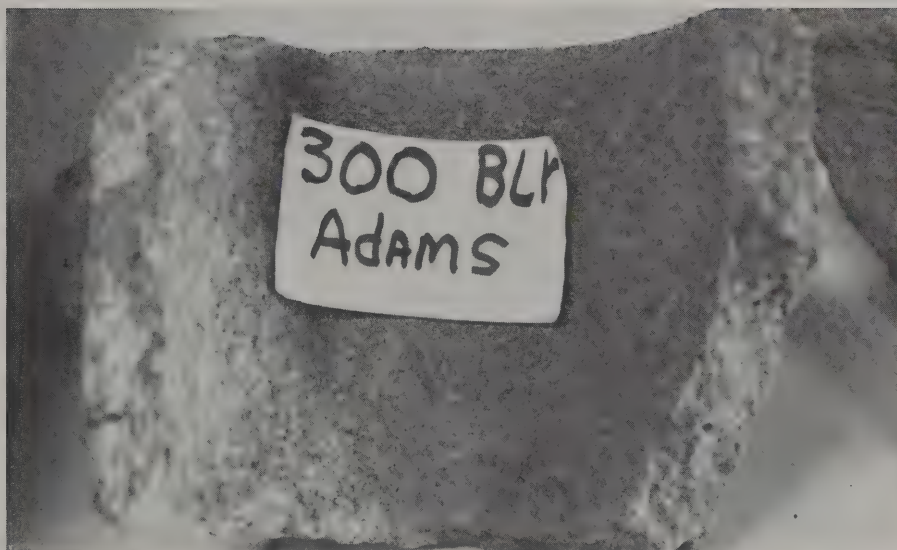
A section of concrete pipe from the 300 Block of Adams. The pipe deteriorated into small, broken sections which no longer provide a suitable conduit for sewage.
